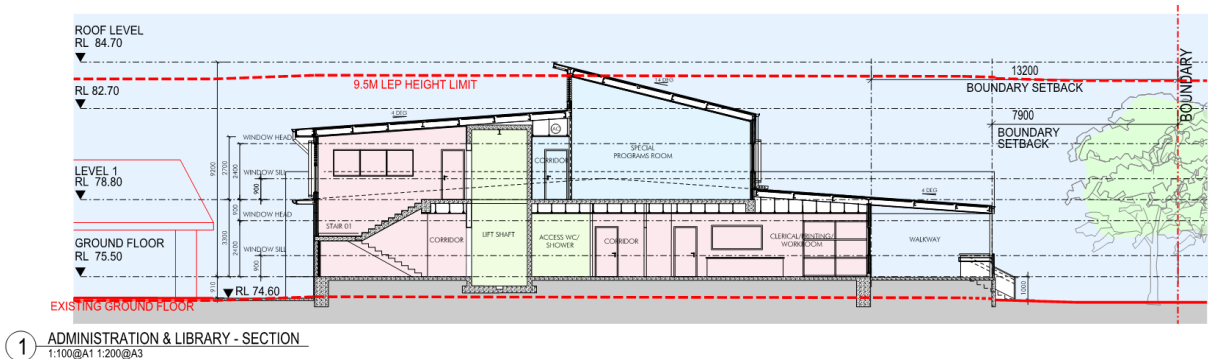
Section of proposed Administration/Library Building, 9.5m building height limit indicated by red dotted line (Source: SARM Architects)
